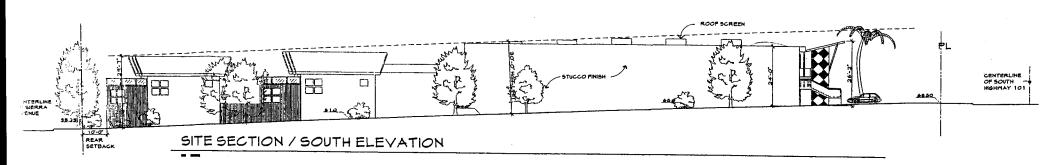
APPLICATION NO. 6-03-116 Site Plan California Coastal Commission
